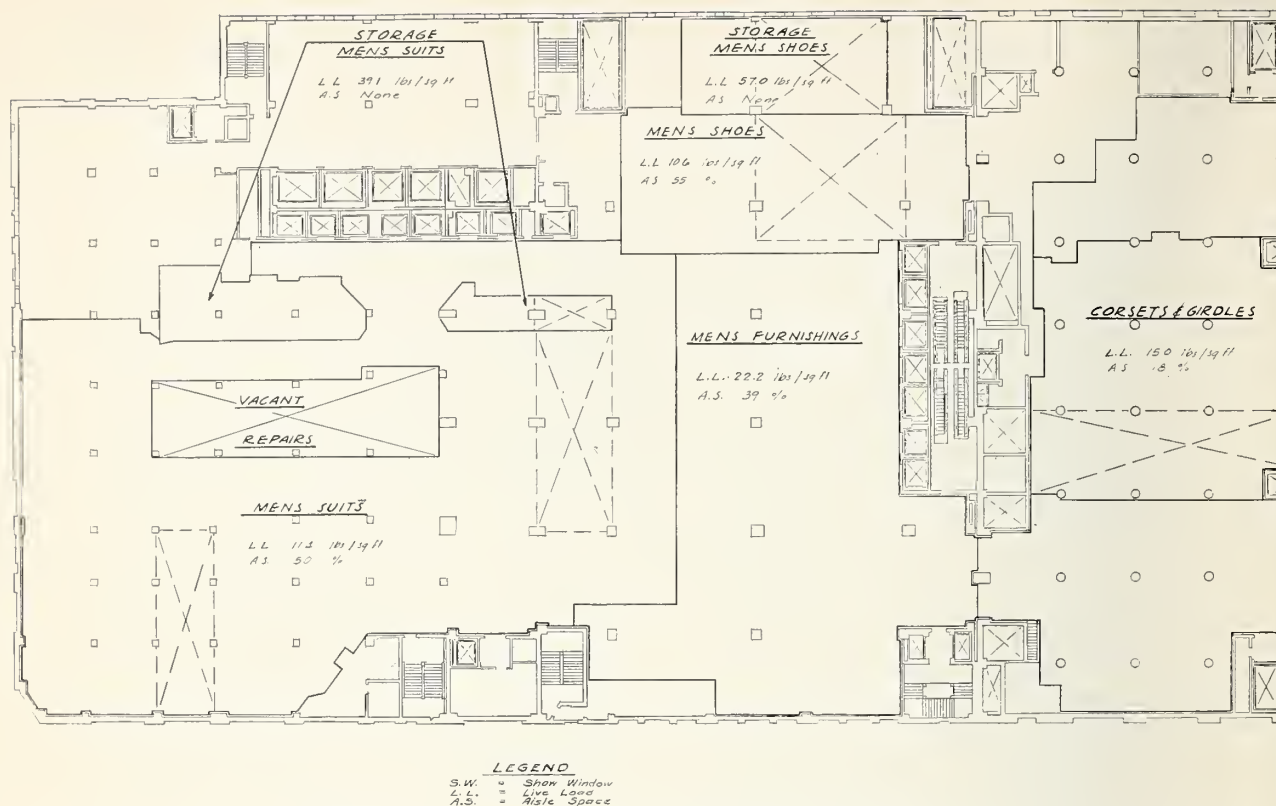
Second-floor plan, department store, New York, N. Y.
